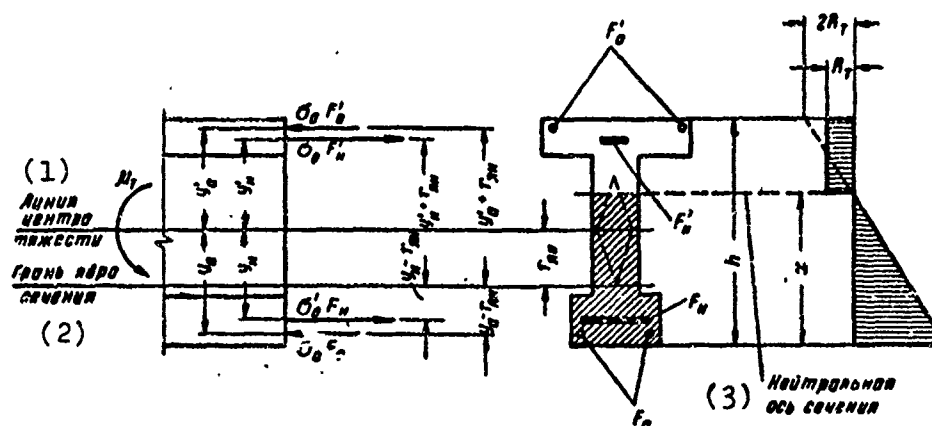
Diagram of the distribution of forces and stress diagram in the transversed section of a bent prestressed reinforced-concrete element in rating the zone compressed by an external load for crack formation, in which stressed and unstressed reinforcements is contained.
